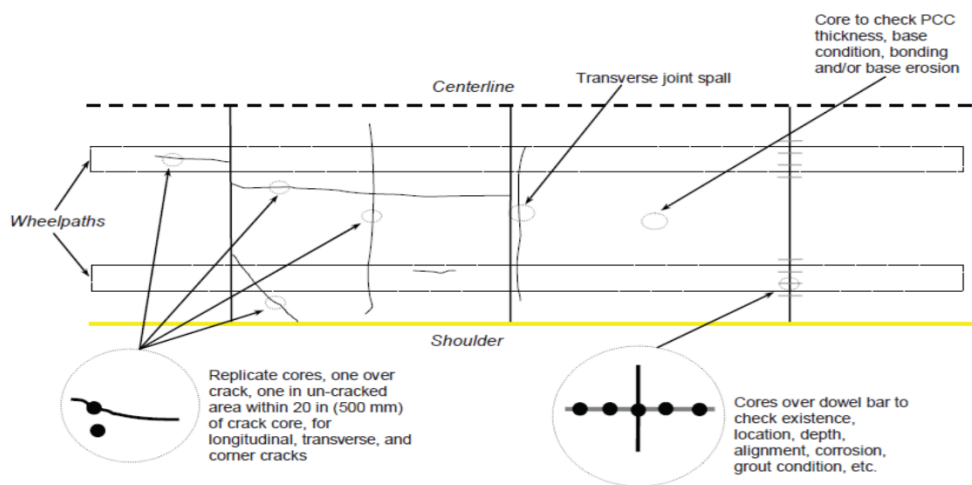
Examples of Core Locations for Jointed Plain Concrete Sections.
